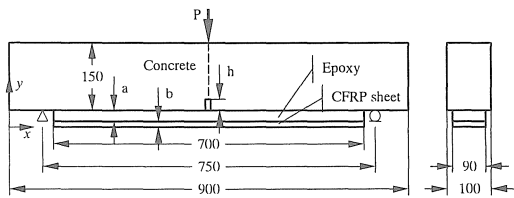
A CFRP-strengthened three-point bending concrete beam (unit: mm)
